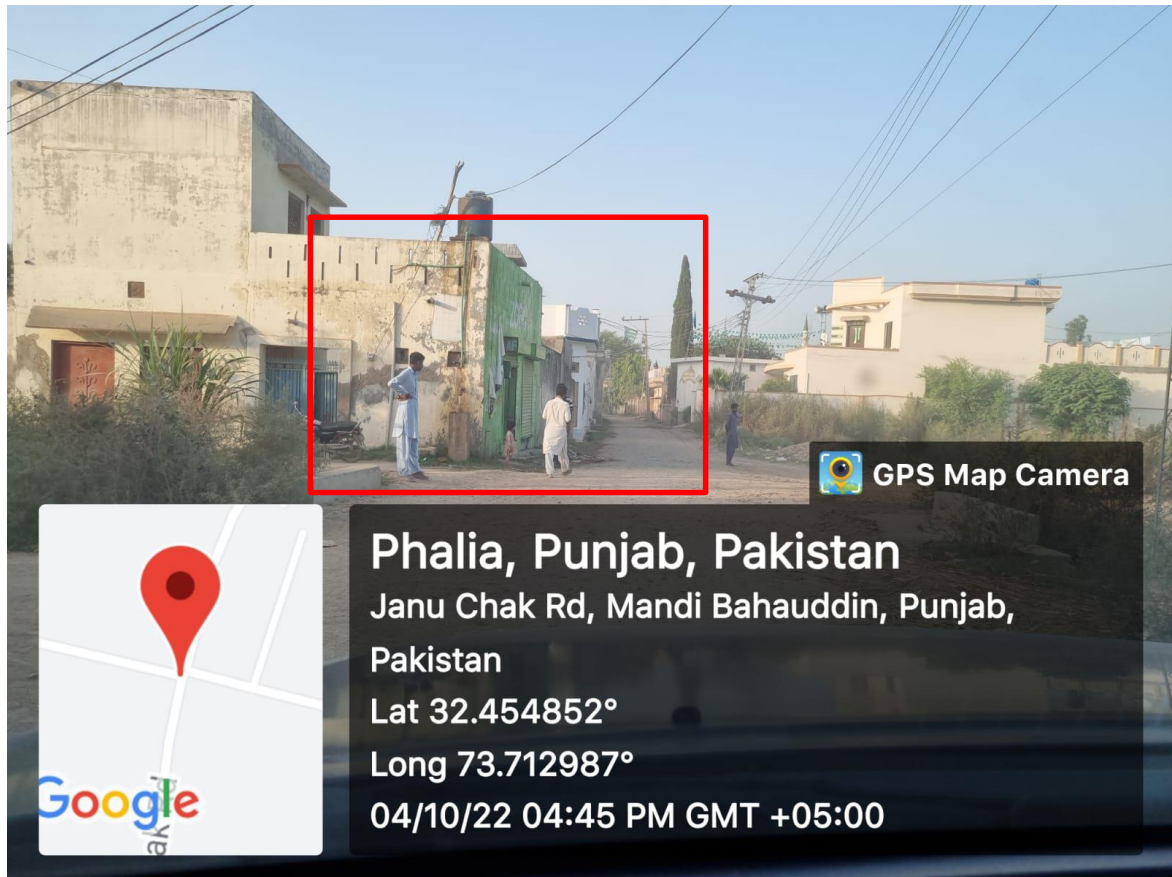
House Right at Road Edge leading to Compromised Shoulders and Metalled Width
